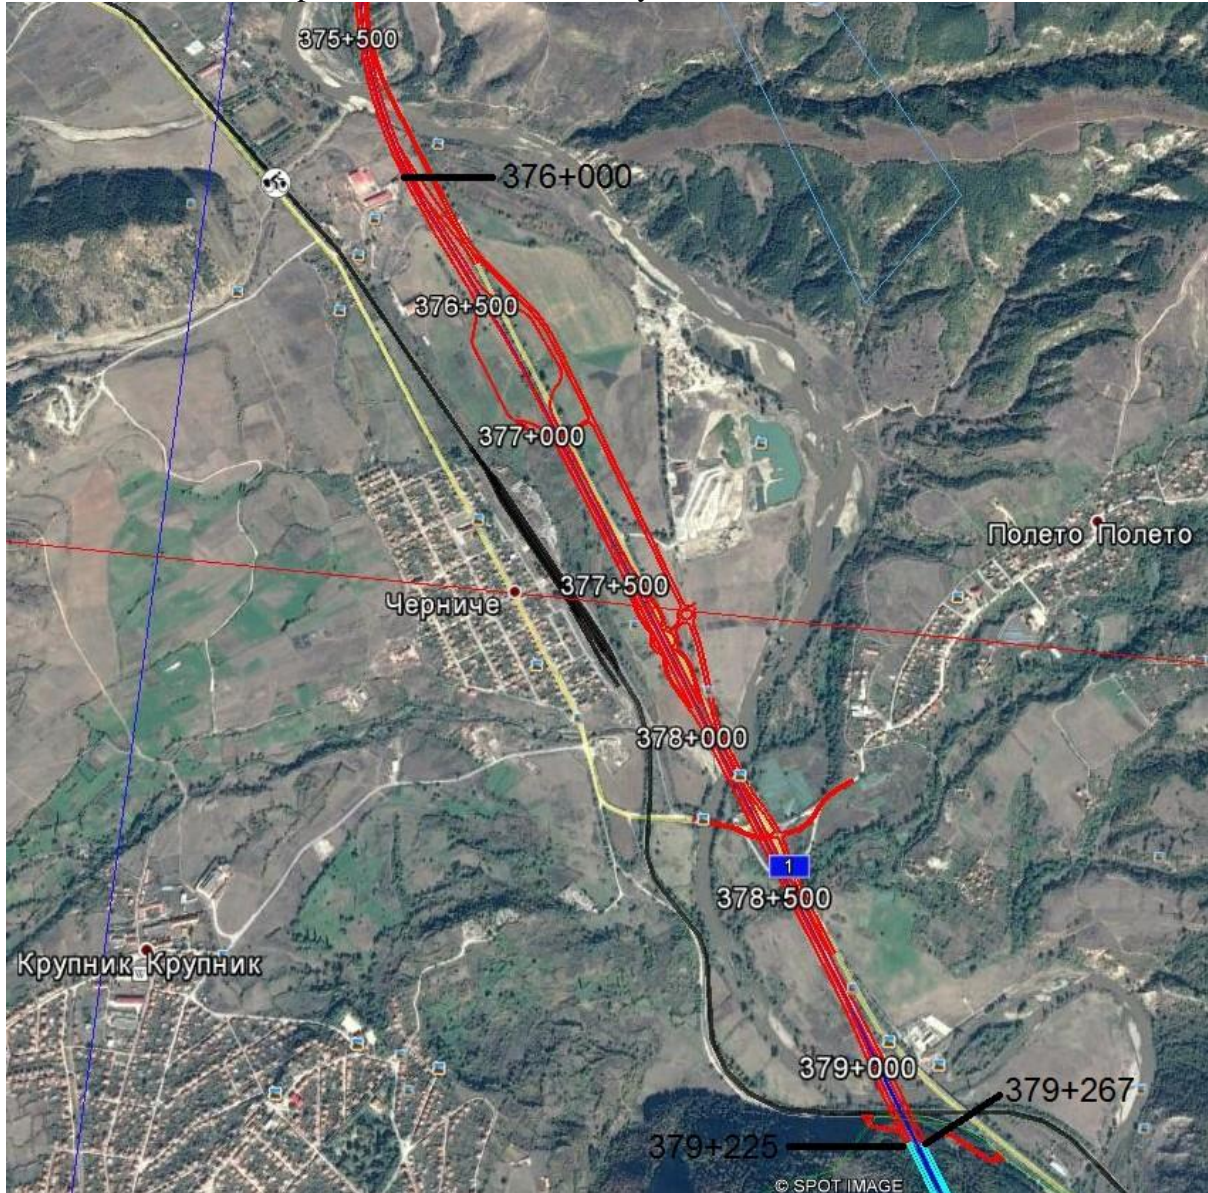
Situation of the road section, km 376 + 000, end of the section, km 379 + 225 north gate, right road lane of tunnel Kresna, km 379 + 267.015 north Portal, left roadway of the Kresna tunnel
